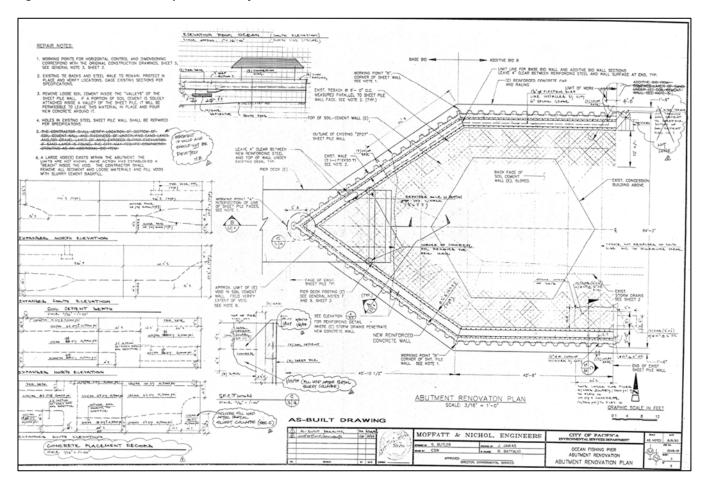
Reinforced Concrete Wall at Pier Abutment – 1993 Repair Project
